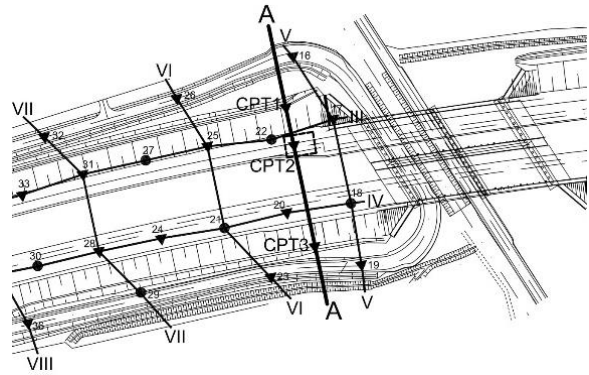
Plan view of the construction site and the location of CPTs and the monitored cross-section A-A
